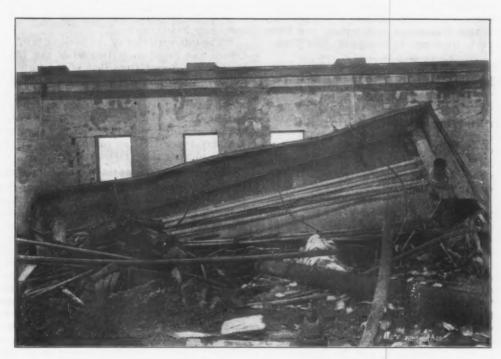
Steel Tank Which Fell 14 Feet to the Fourth Floor and Caused the Only Break Made in the Flooring.
